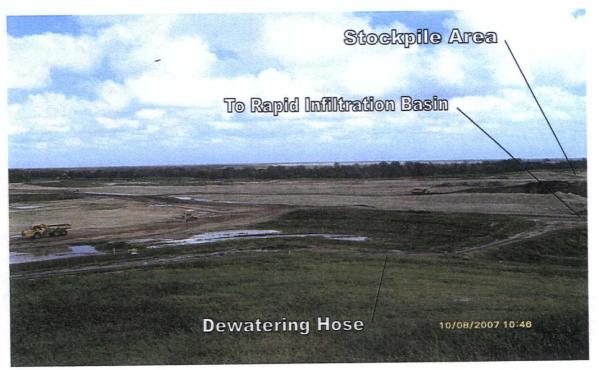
October 8, 2007 Section 9 Construction photo showing rain water being dewatered to the Rapid Infiltration Basin.
